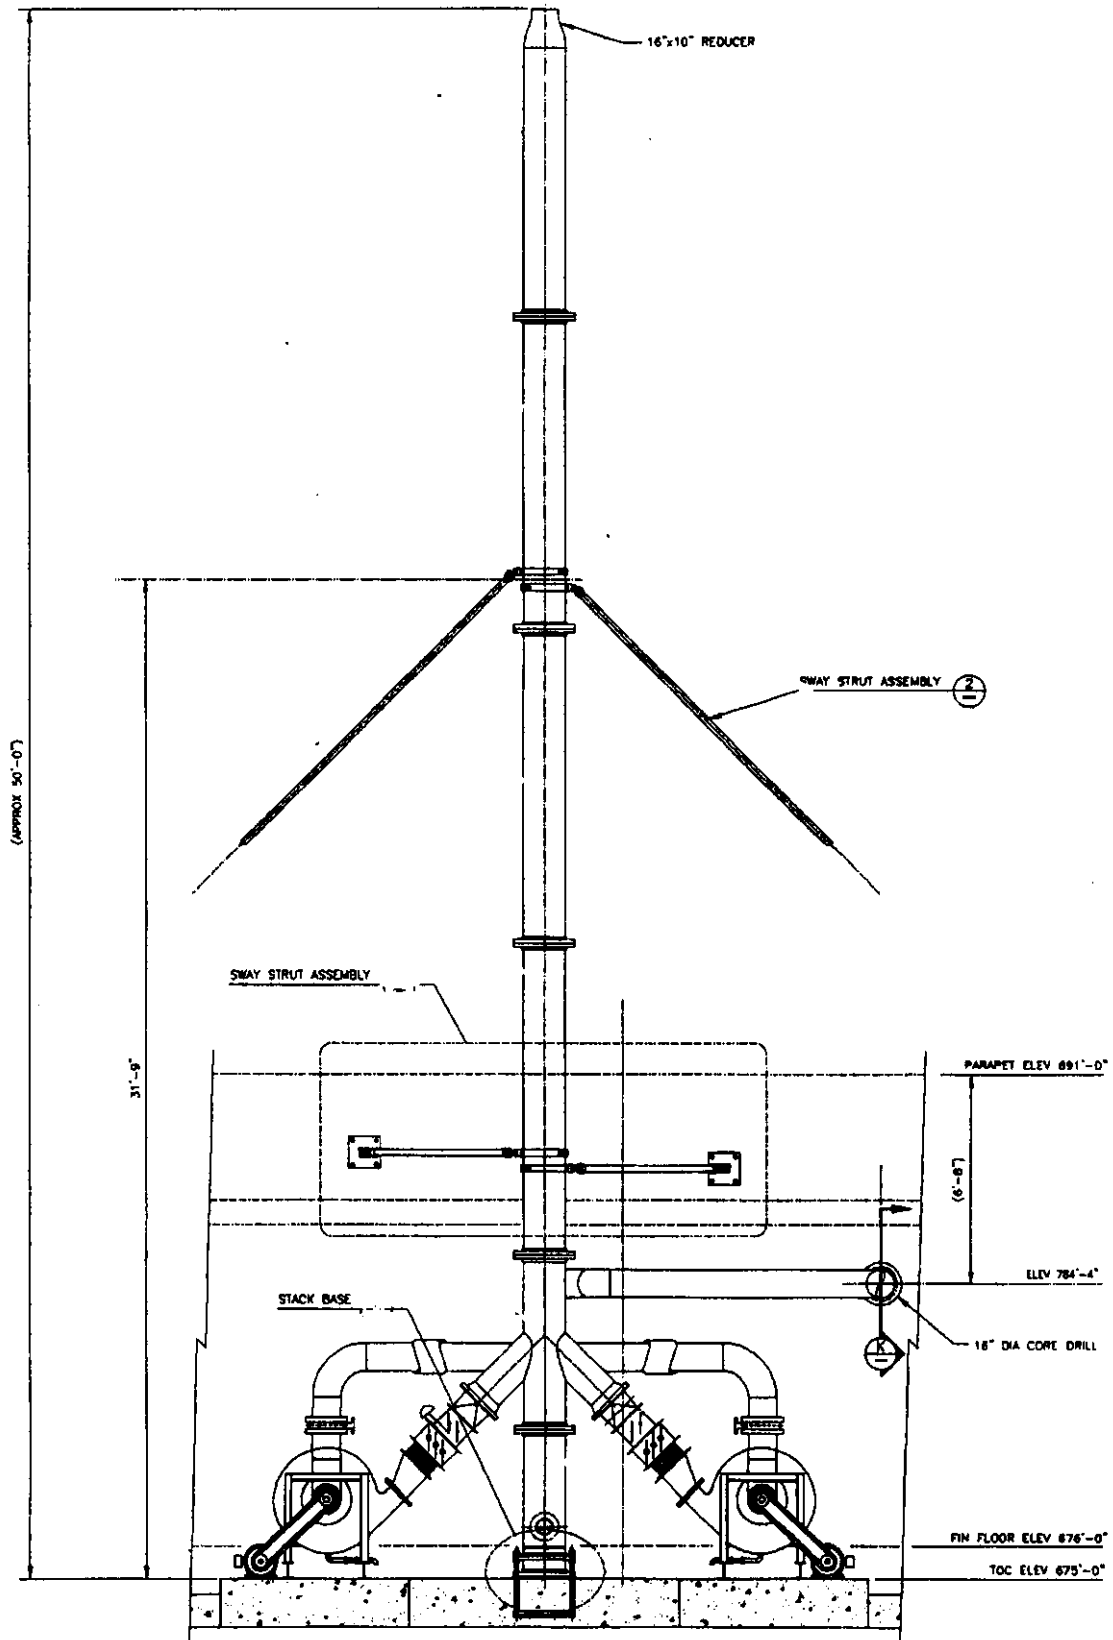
2736-ZB Building New Process Exhaust System Stack.
